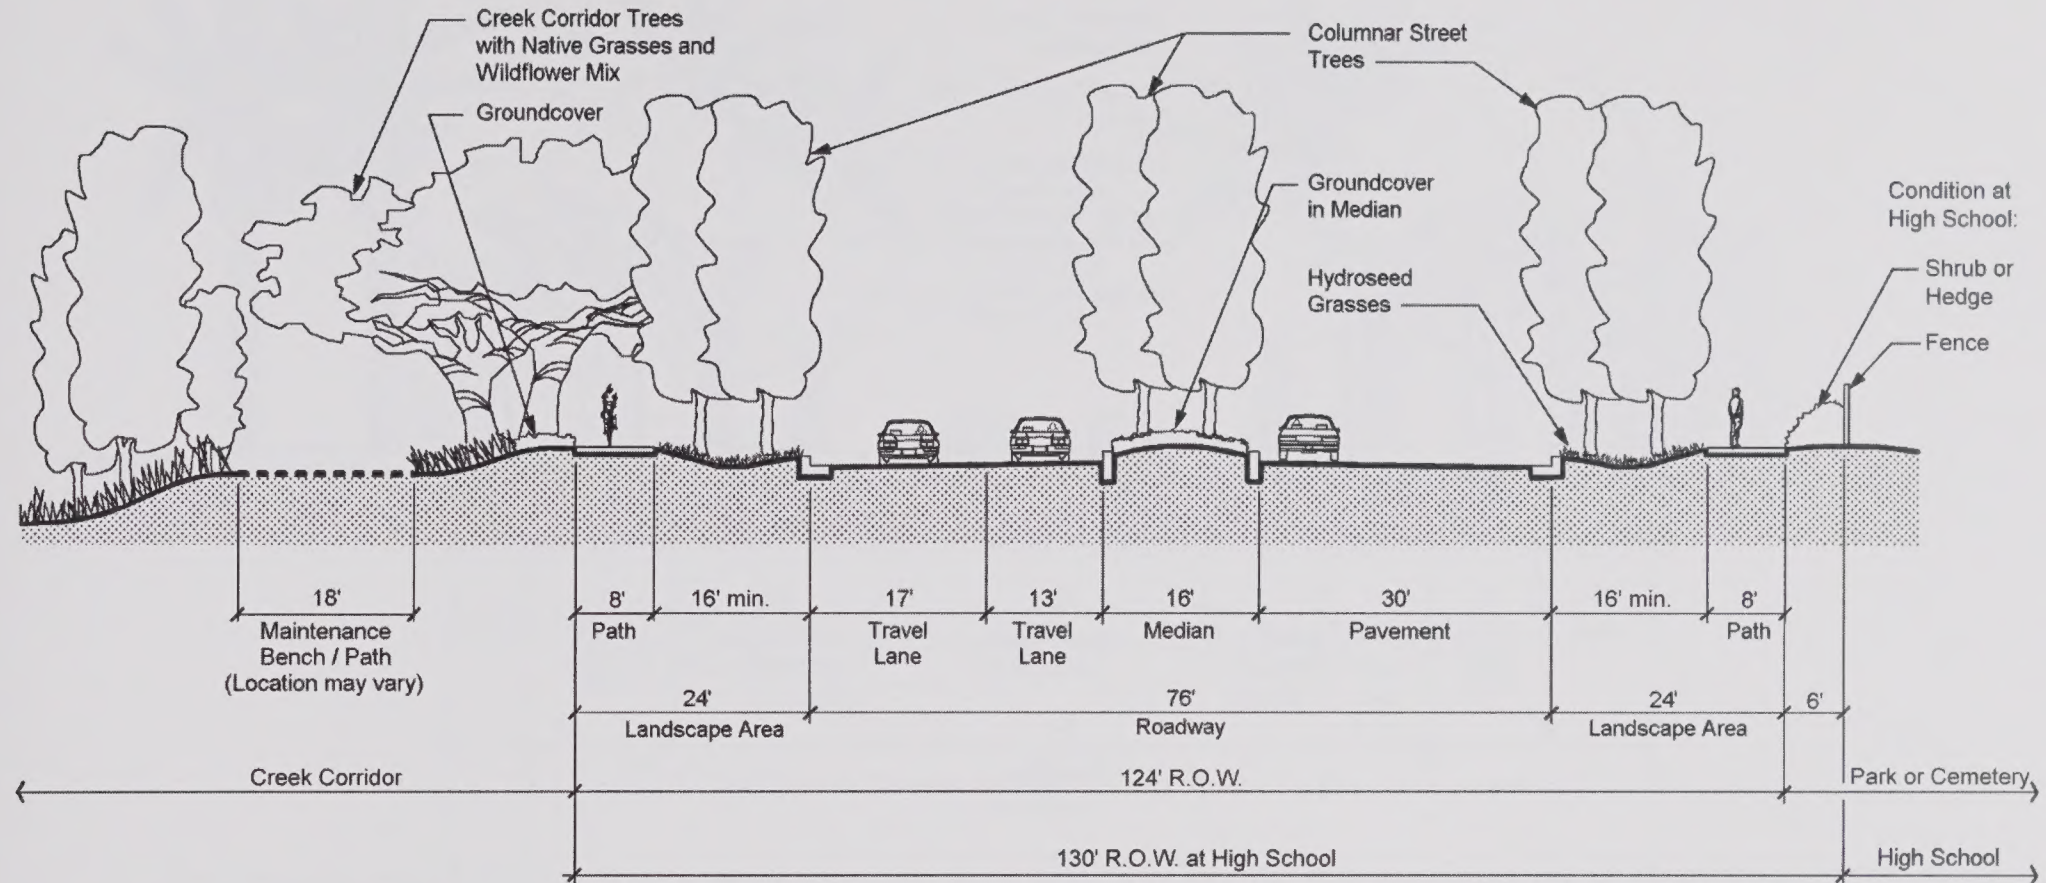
SECTION M – LAS COLINAS ROAD AT CREEK/RESIDENTIAL
